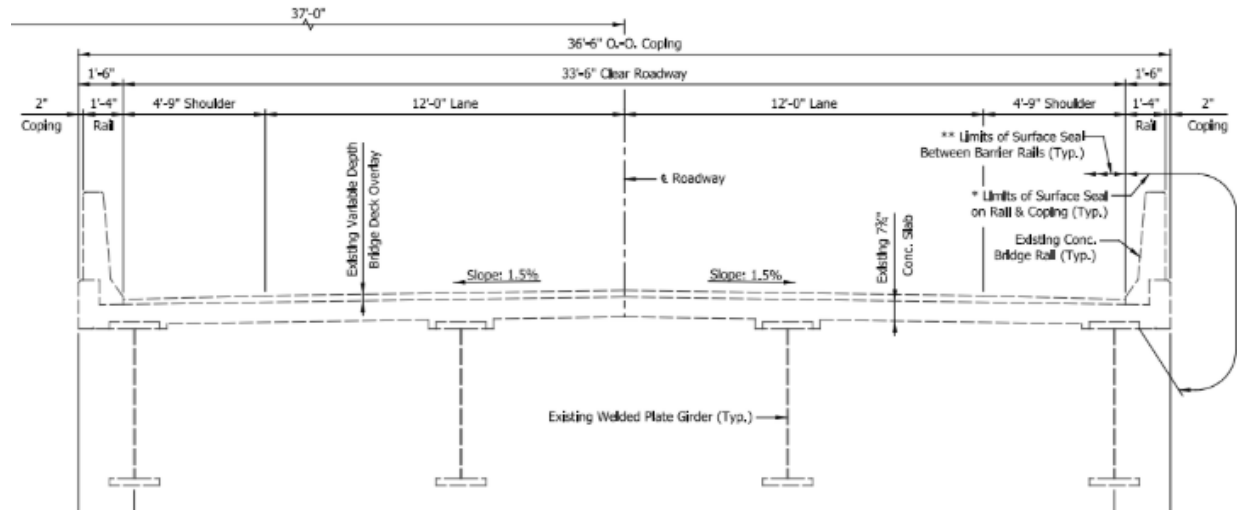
Typical Section of 5-7 of the Bridge (NBI 33240) (2014)
